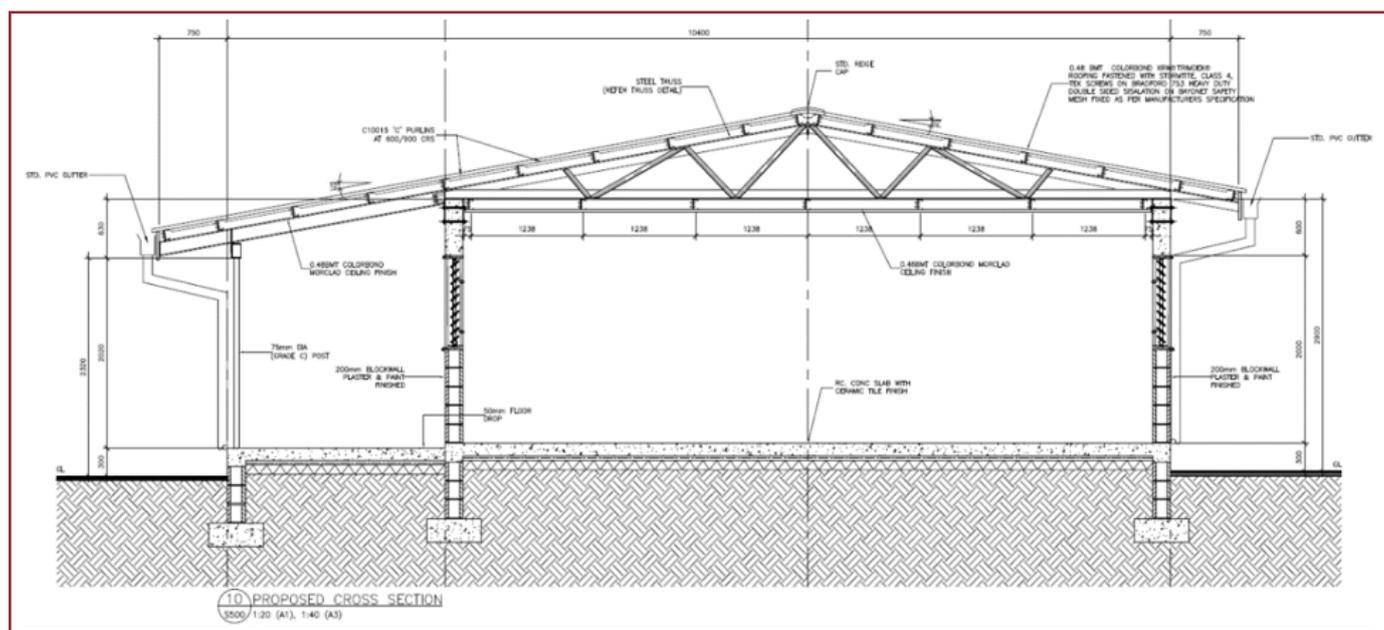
Typical Section, New Classroom Building, Nailuva District School (Source: Construction Implementation Unit, Ministry of Economy, Fiji)
